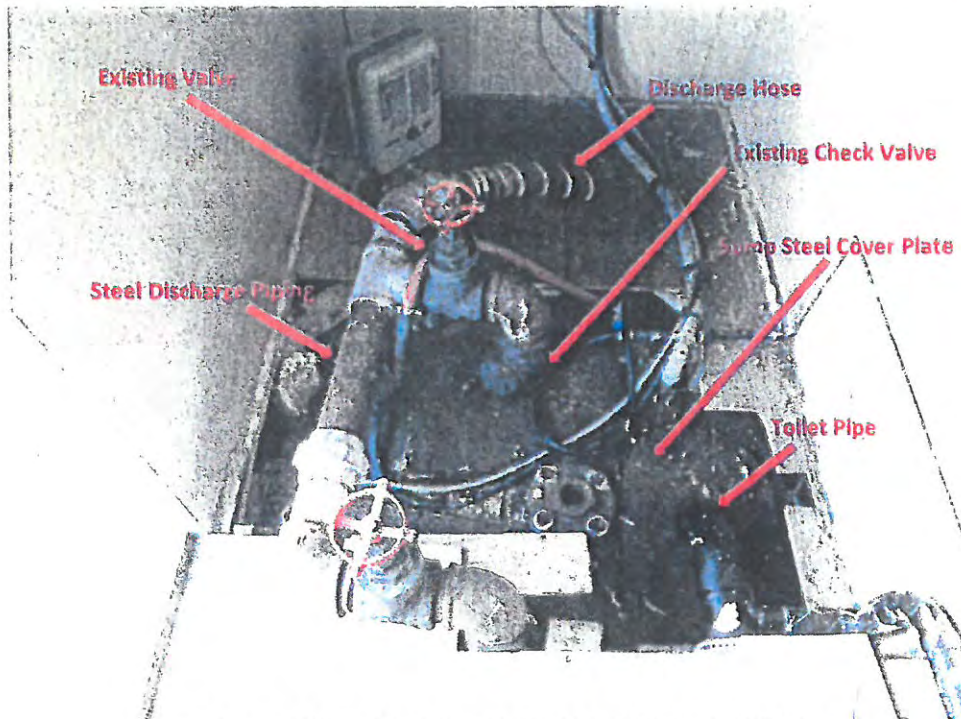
Sump Plate and Steel Discharge Piping and Valves, and Toilet Pipe
